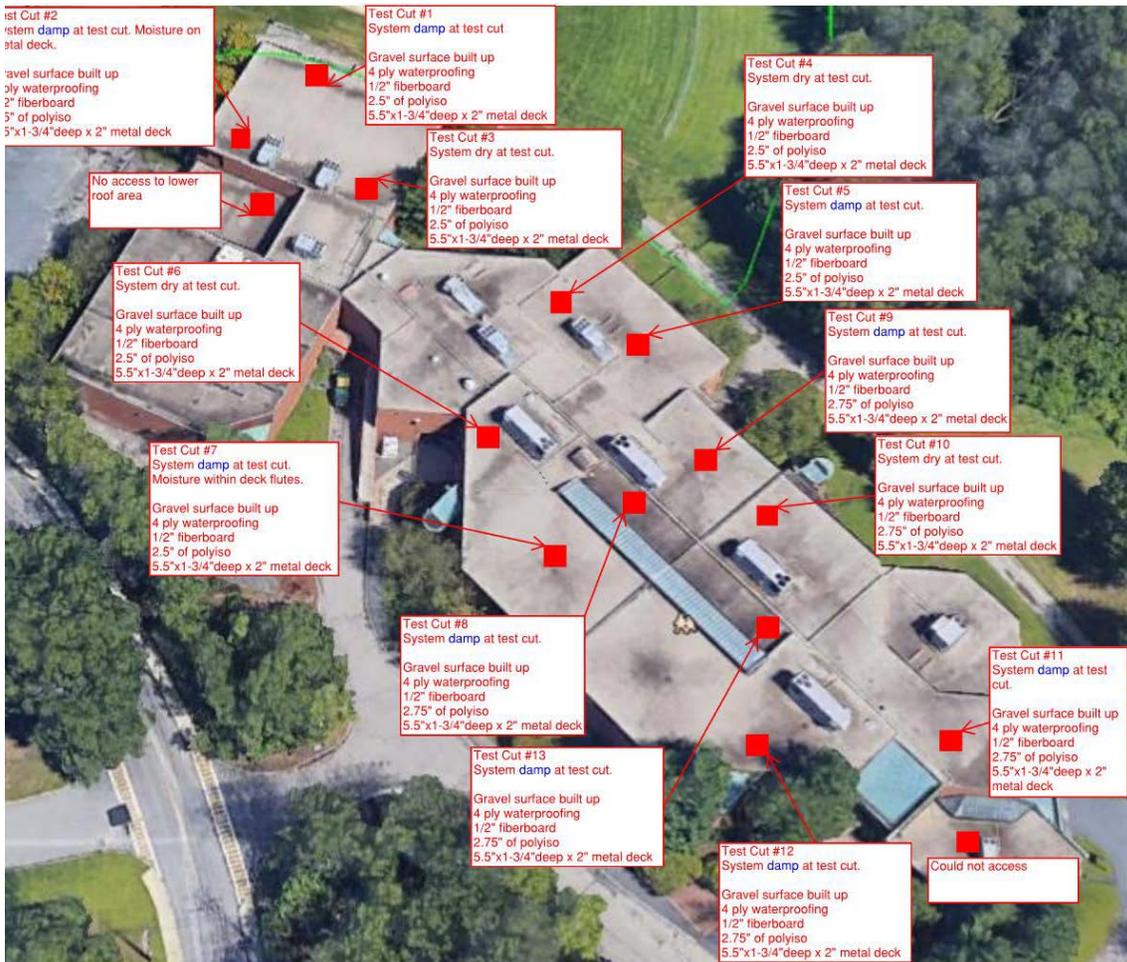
Framingham Farley School – Partial Roof Area Plan – Approximate Test Cut locations
